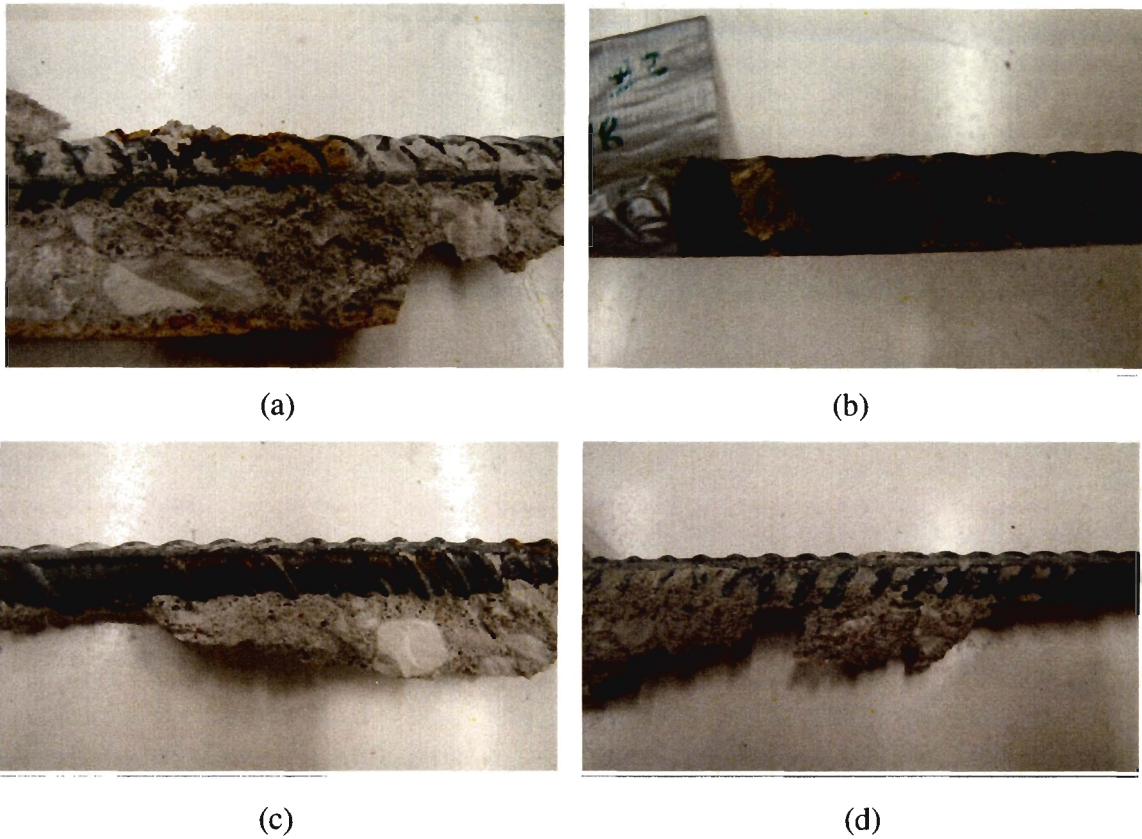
Reinforcement examination of Mix No. 2 containing 2 bars. Reinforcement is at 1 in. (25 mm) from reservoir surface. (a) Corrosion developing on reinforcement. (b) Corrosion spot on reinforcement. (c) and (d) No signs of corrosion on reinforcement.
